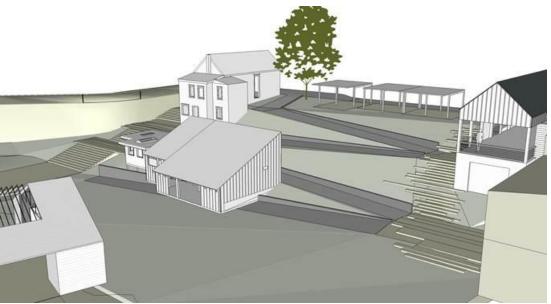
Full Preservation Alternative, showing rehabilitation of Boatyard Office Building and Tool Shed and Water Tank Building left of center, looking south. Source: TGH Architects, 2017.
